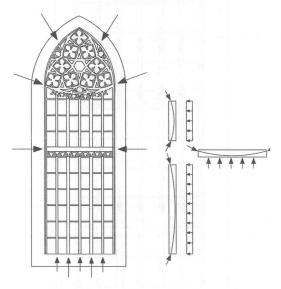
Structural model. Left: supporting reactions due to wind load. Right: vertical bars and horizontal beam subjected to wind load (principal diagram)
